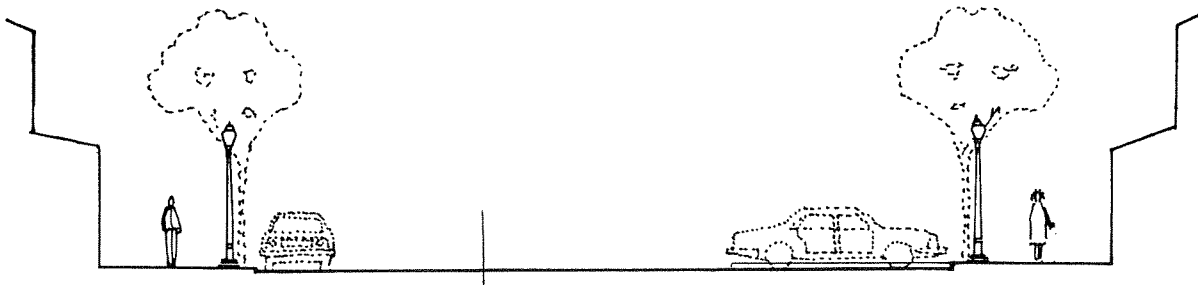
Possible Main Street Cross-Section With Parallel Parking One Side
